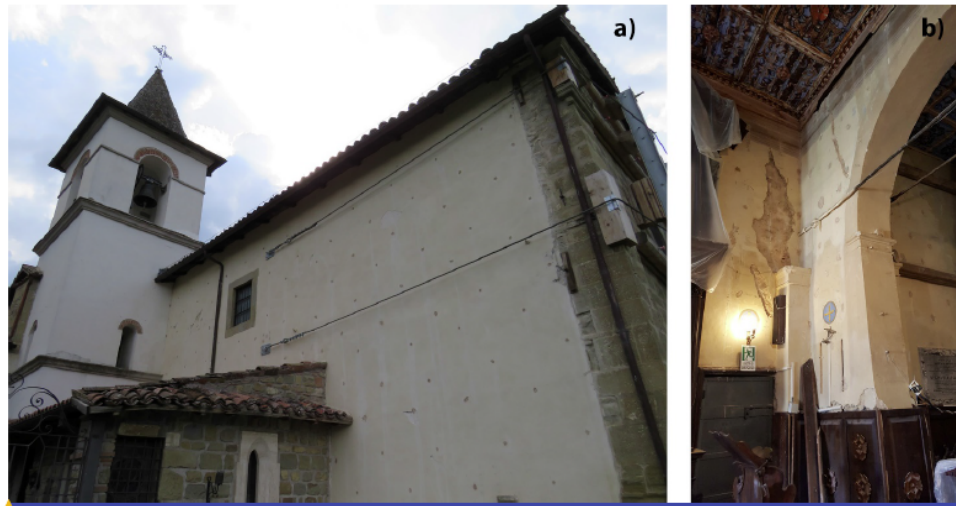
(a) Signs of the execution of reinforcement injections on the walls of the church; (b) second iron tie carried out in pairs with the one existing at the triumphal arch.
